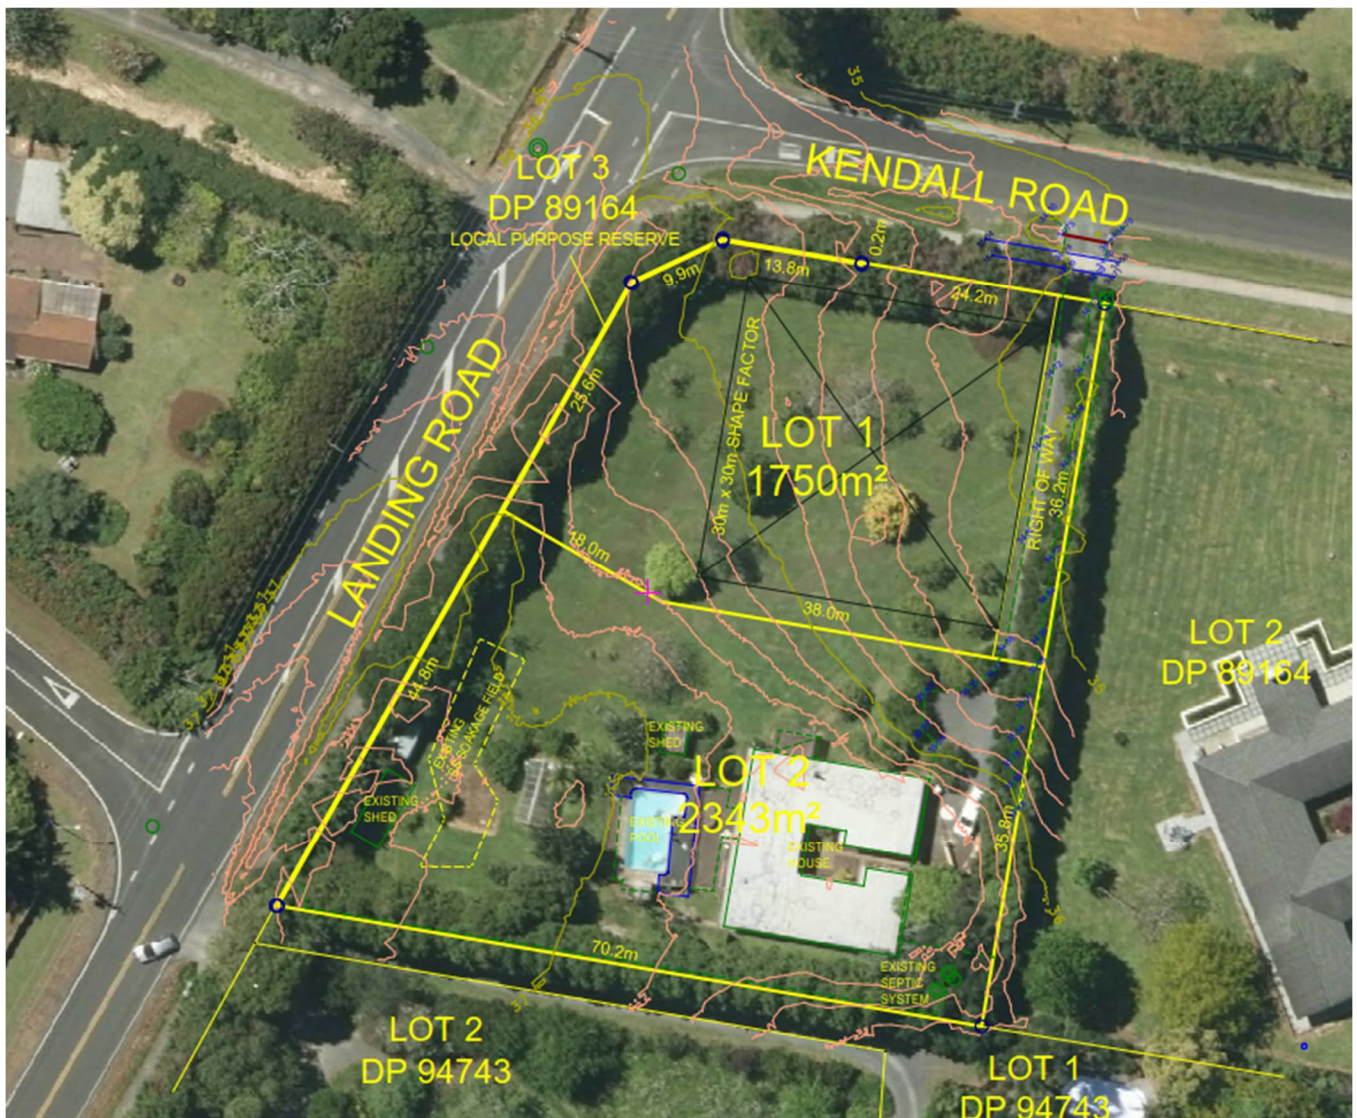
Proposed subdivision plan (provisional). Source: Williams and King Surveyors, provided on 4 March 2026.
